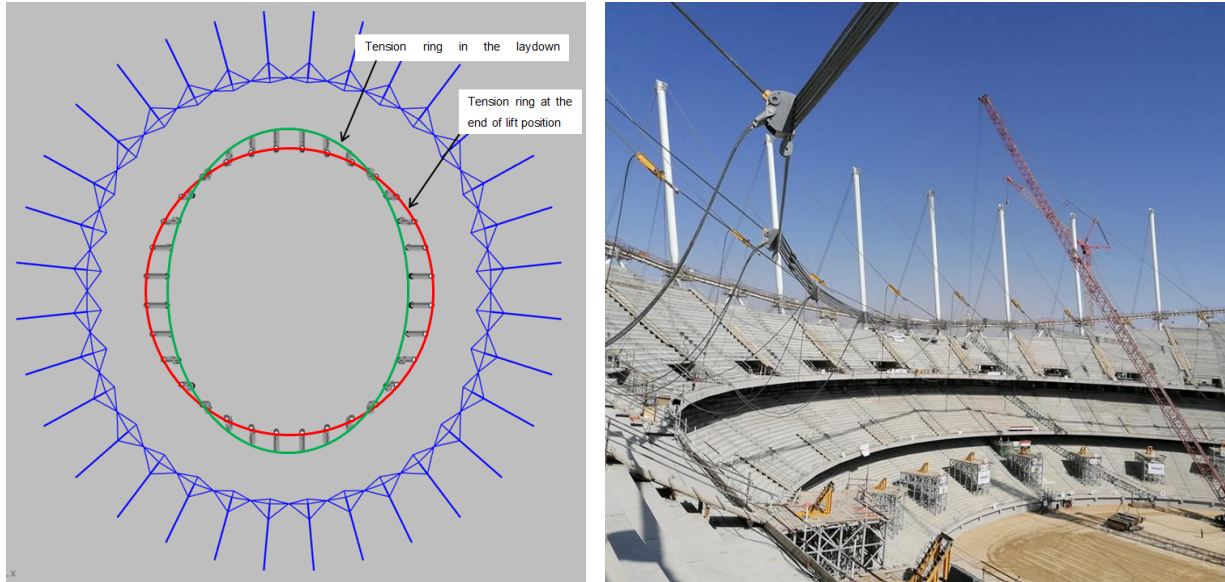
Plan view and photo from the site of the inner cable ring lifting procedure
